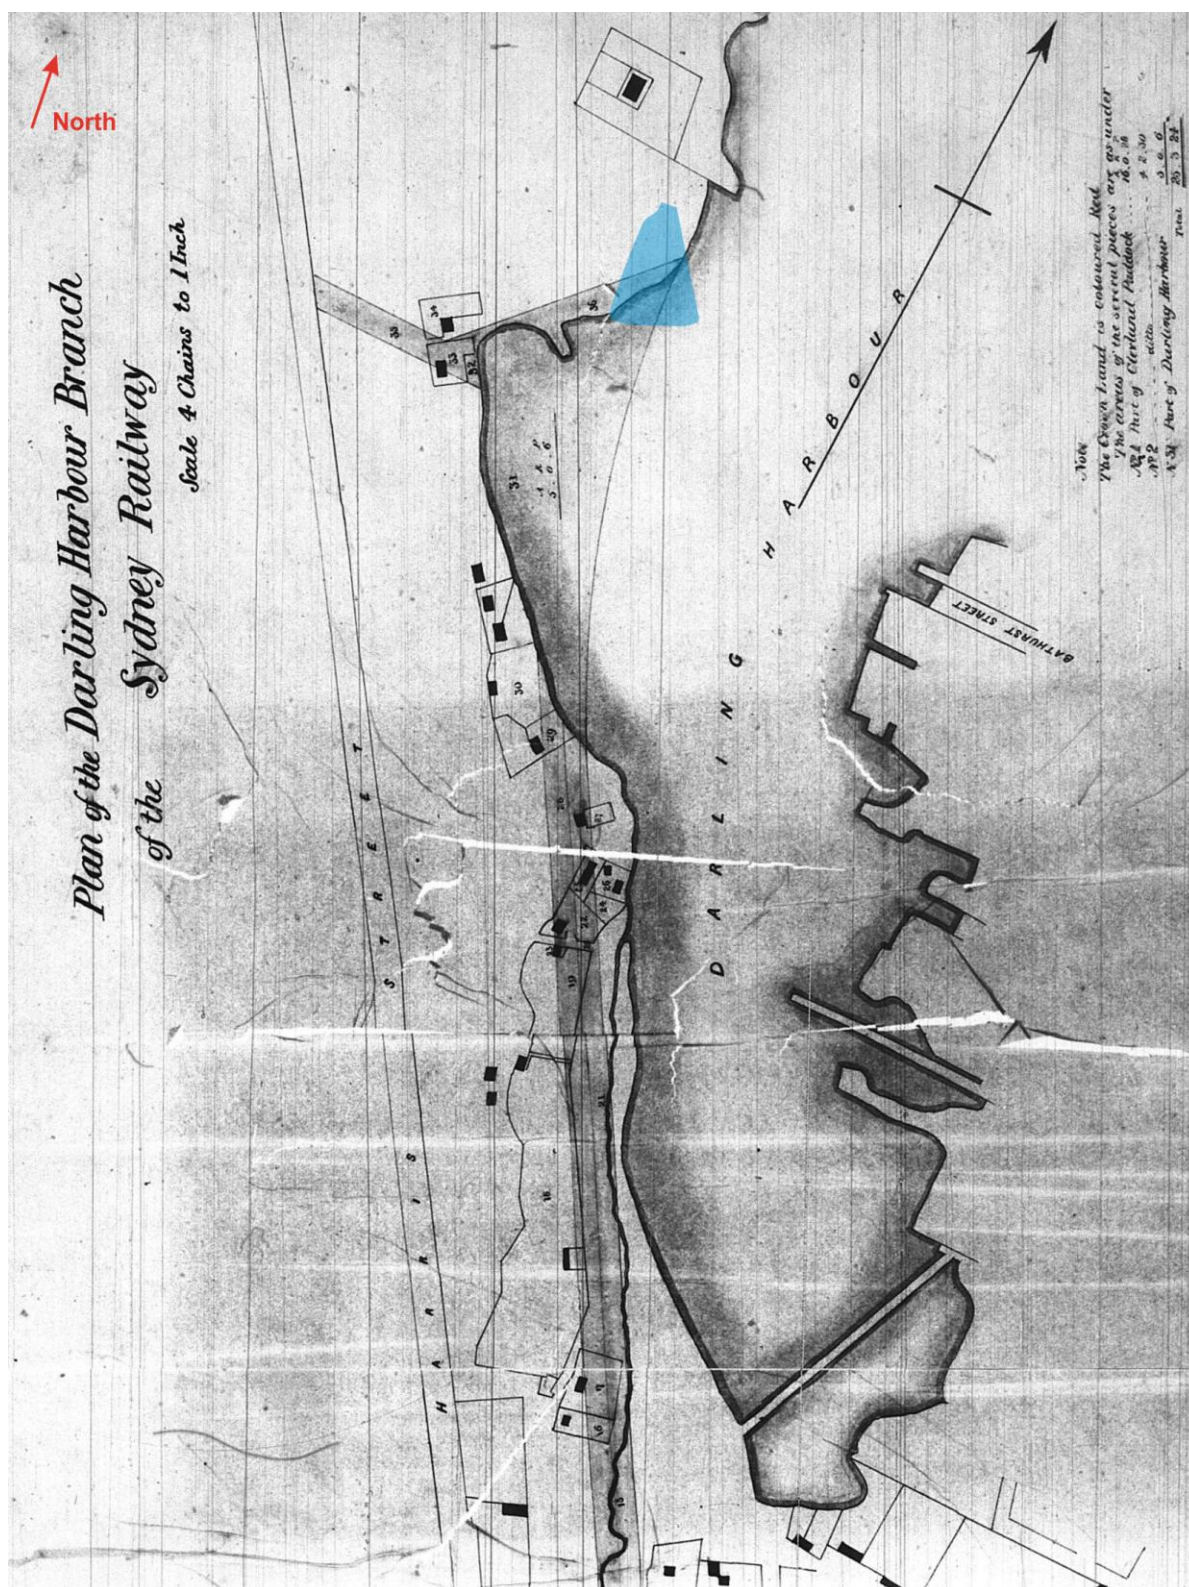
Detail of a plan of Darling Harbour and proposed Sydney Railway, c1853, in the Surveyor General's Sketchbook. ICC Hotel site shaded blue. Surveyor General's Sketchbooks c1853 vol 6, folio 70-71, SRNSW.
